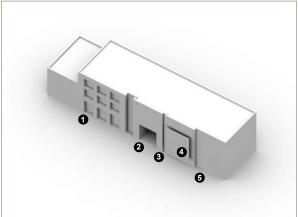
STREETWALL CALCULATION EXAMPLE
